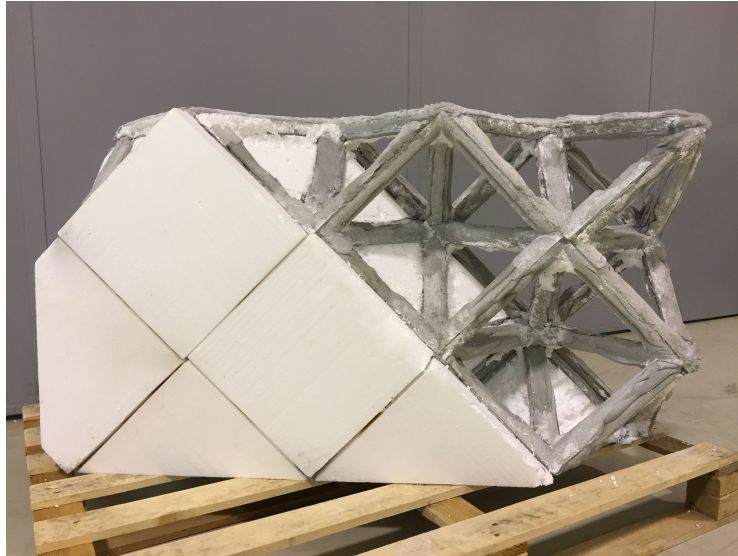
Space Truss Masonry Wall with Robotic Extrusion, published in [5]
